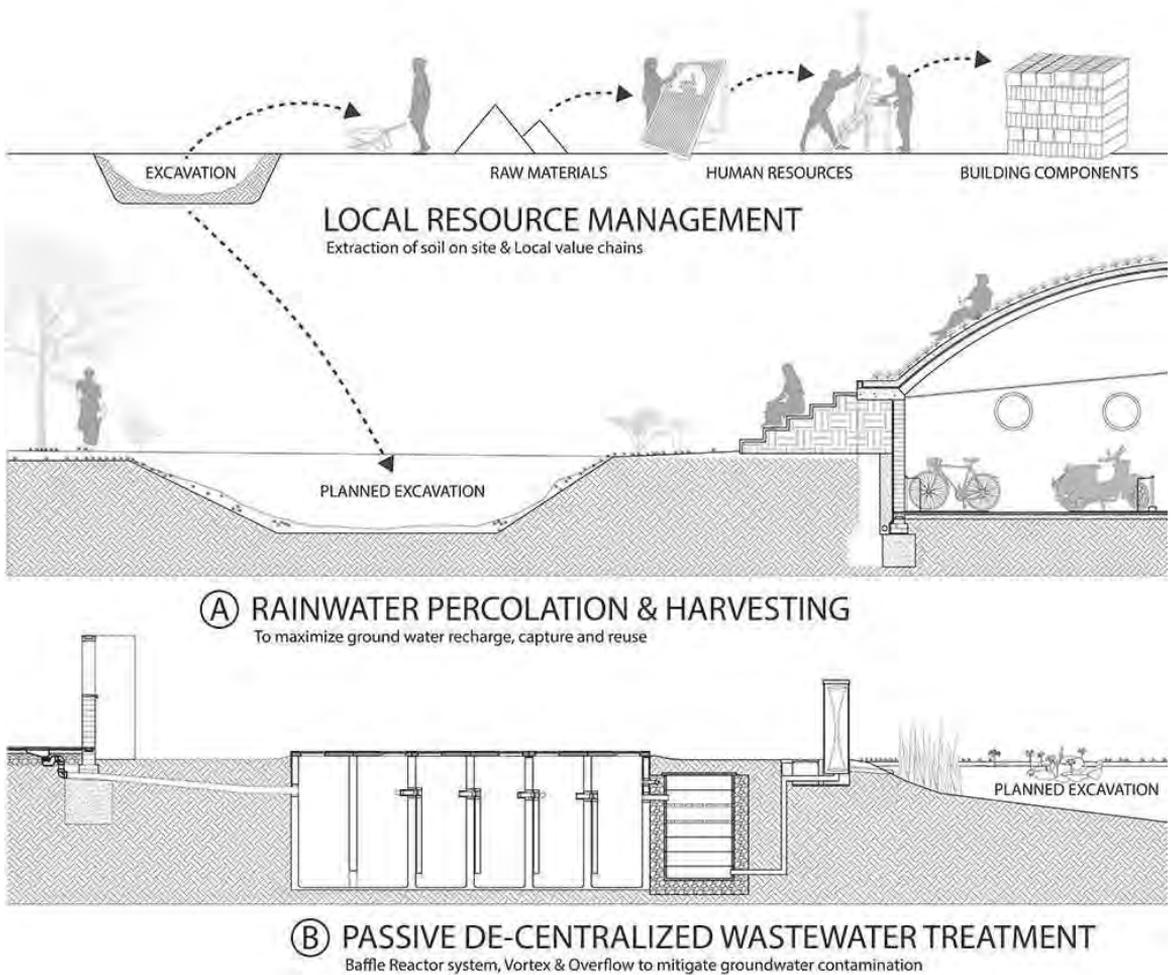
Extraction of soil for construction and reuse of excavation pits, (Source: AVEI School)
